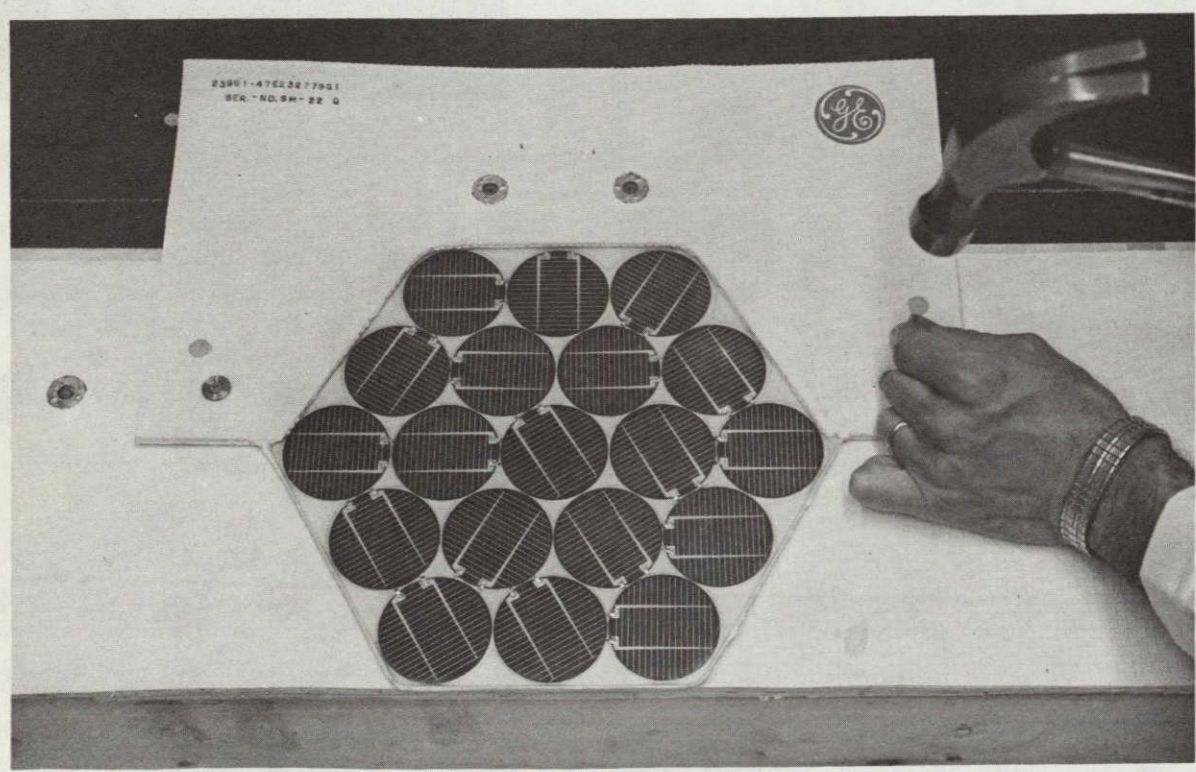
Nailing of Shingle Module to Roof Sheathing
